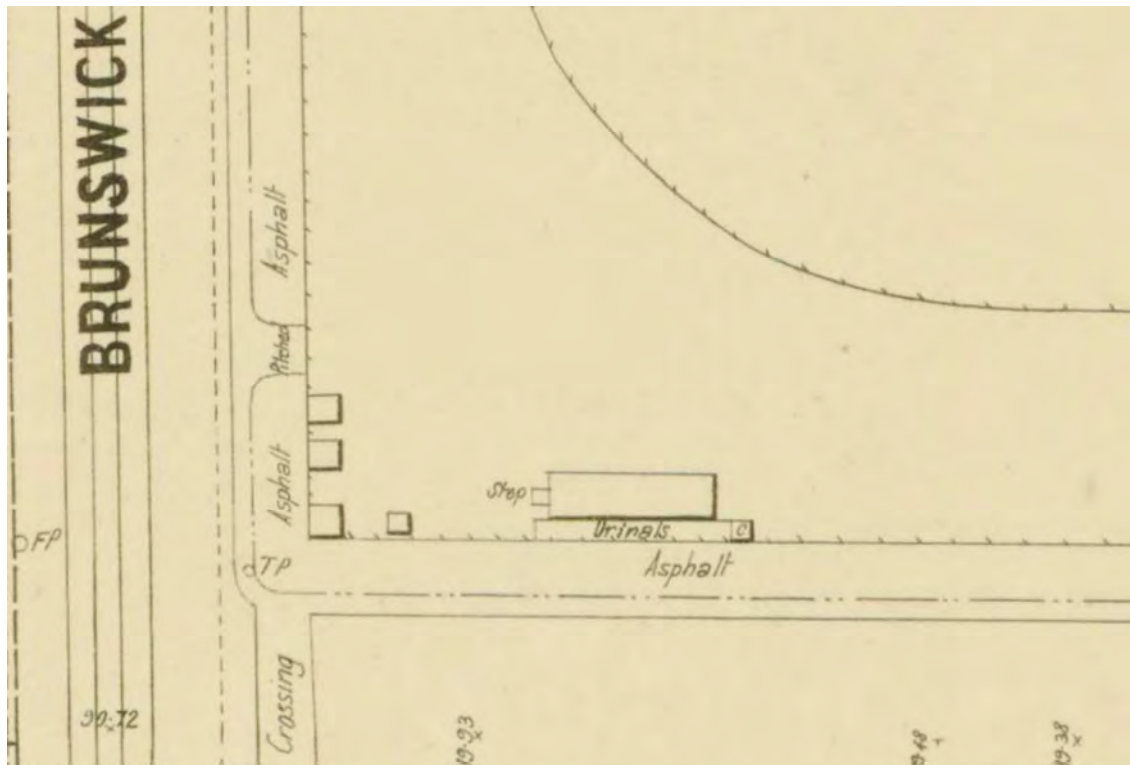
Detail of a c. 1901 MMBW plan 1258 showing the gatehouse and other structures to the boundary of the grounds
